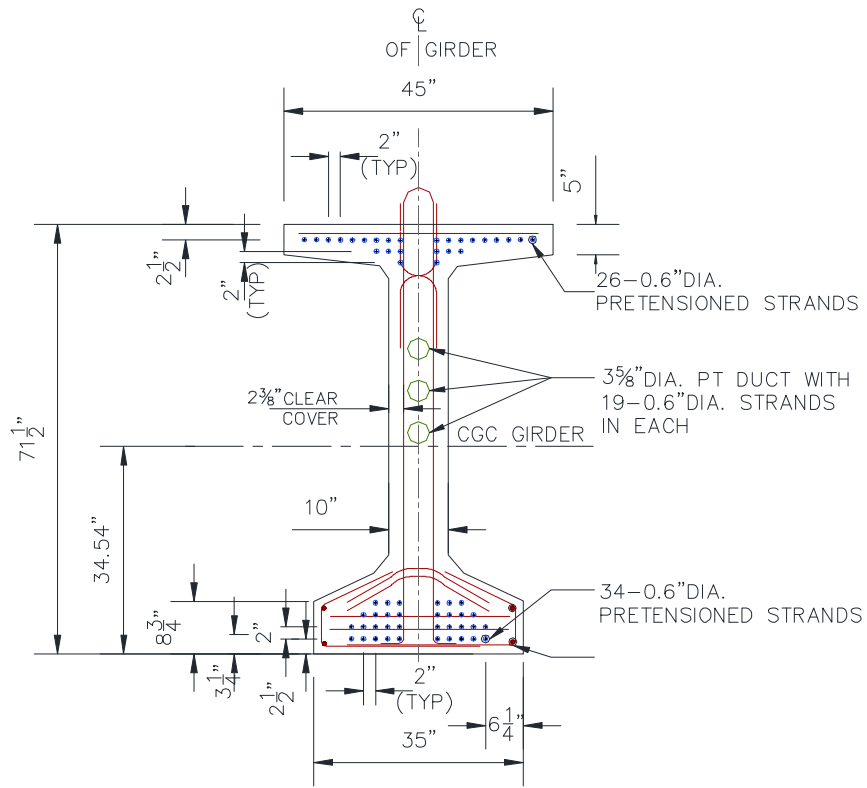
Typical Section Geometry of Modified Tx70 Girder with Widened Web (Adapted from TxDOT 2010).
